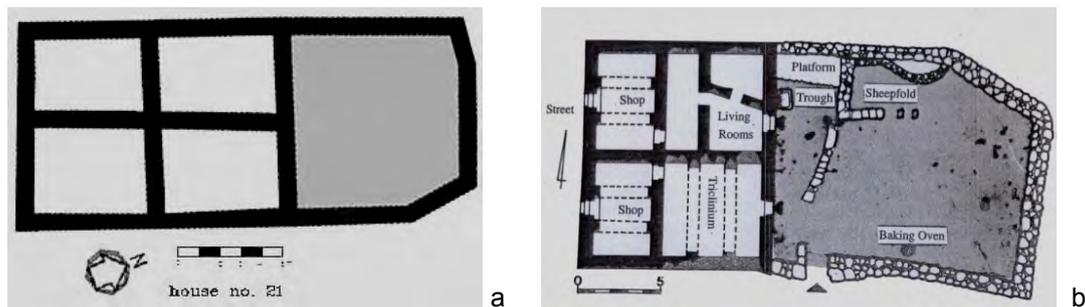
(a) plan of House no.(21) at al-Hallabat, (b) plan of the house at Horvat Susiya (Source: After Hirschfeld, 1995: 3, Fig. 13).
